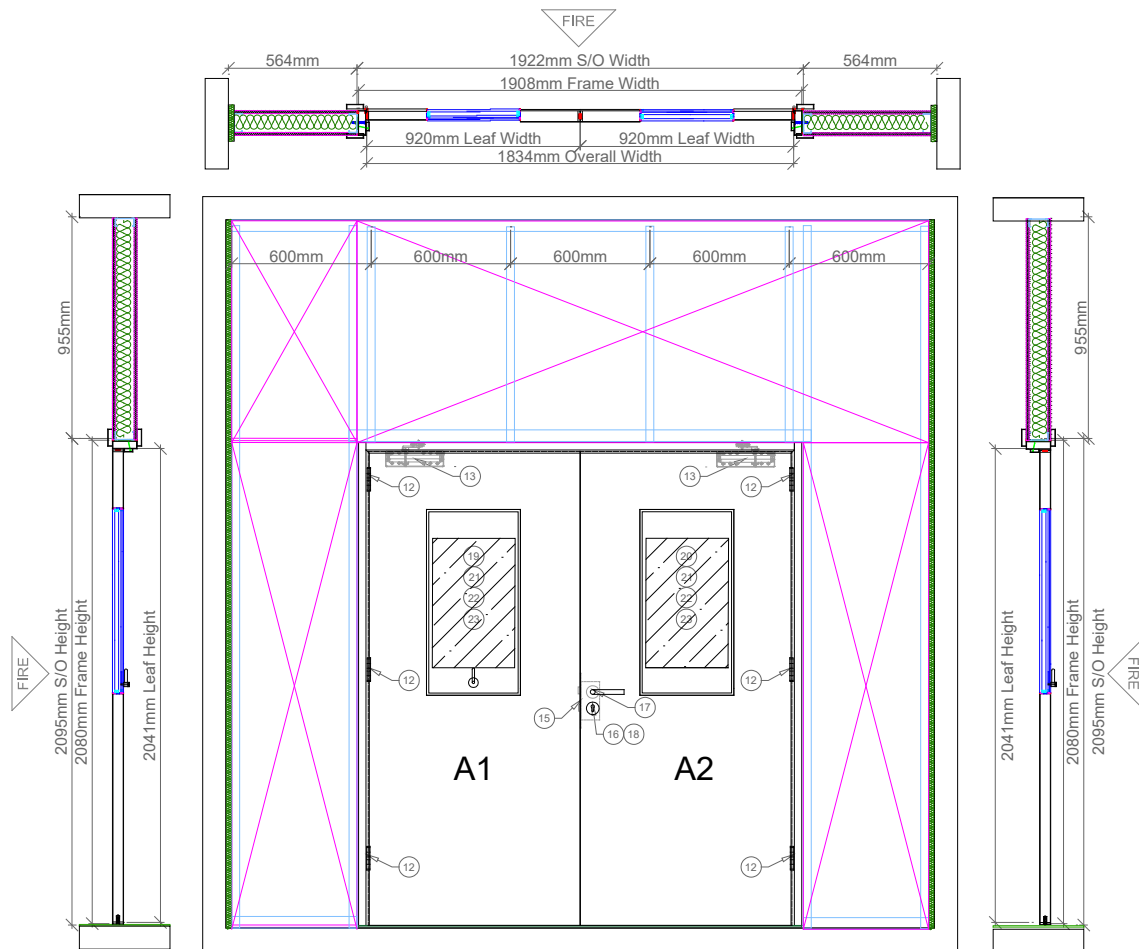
General arrangement of test construction viewed from the unexposed surface
